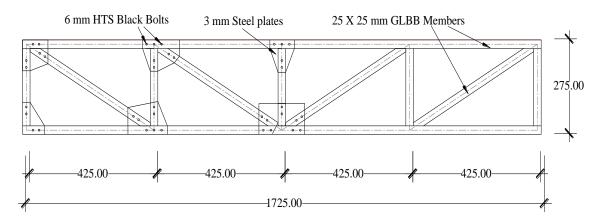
Glue Laminated Bamboo Beam lattice Truss Model Details
